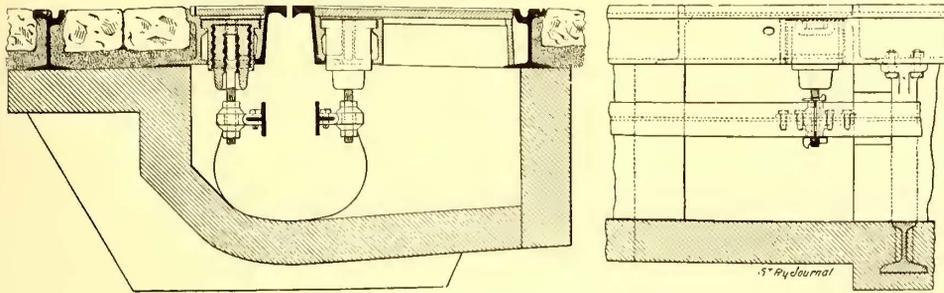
CROSS AND LONGITUDINAL SECTION OF CONDUIT AT INSULATOR.
